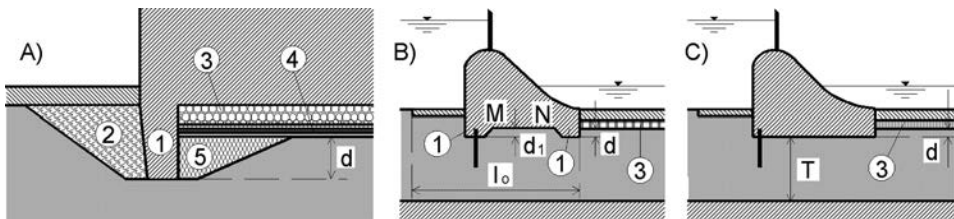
Construction and dimensions of concrete cutoff walls. (a) Construction of cutoff wall in a pit; (B) construction of shallow cutoff walls; (c) dam without cutoff walls: (1) Concrete cutoff wall; (2) clay-concrete; (3) drainage; (4) inverse filter; (5) filling of well-compacted earth.
